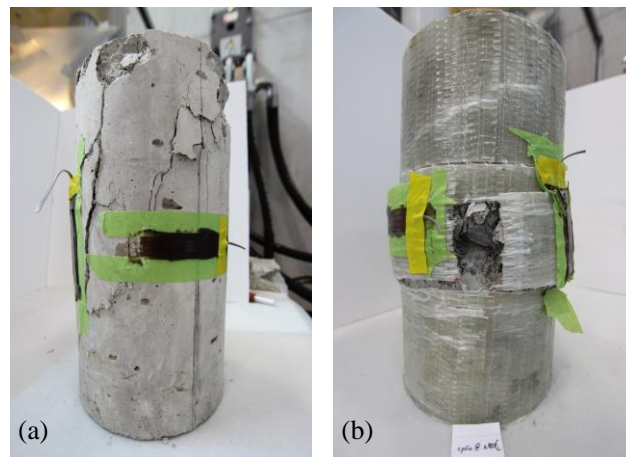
Typical failure modes under fatigue loading: (a) Unconfined (b) Confined concrete
